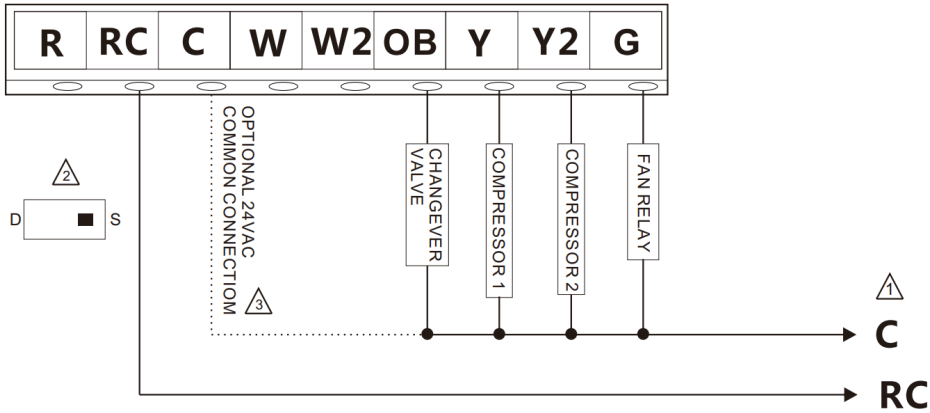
Two-stage heat & cool in heat pump (no auxiliary heat)
